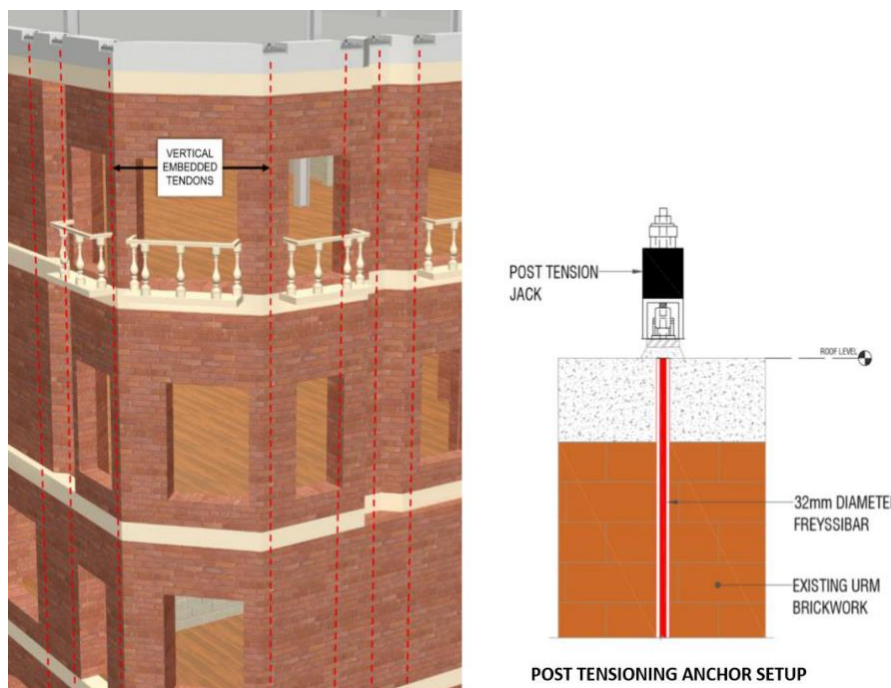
Left: 3D view of the post tensioned vertical rods; and Right: Anchor setup detail
